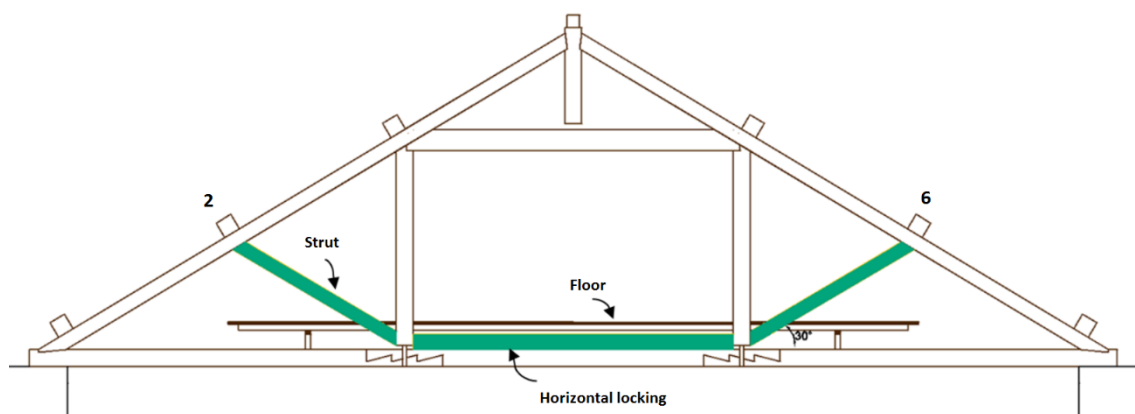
Reinforcement solution for Military Asylum of Runa's truss
